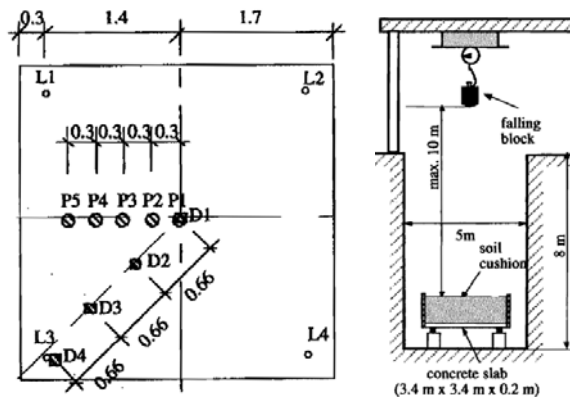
Experimental arrangement used by Calvetti [22]
